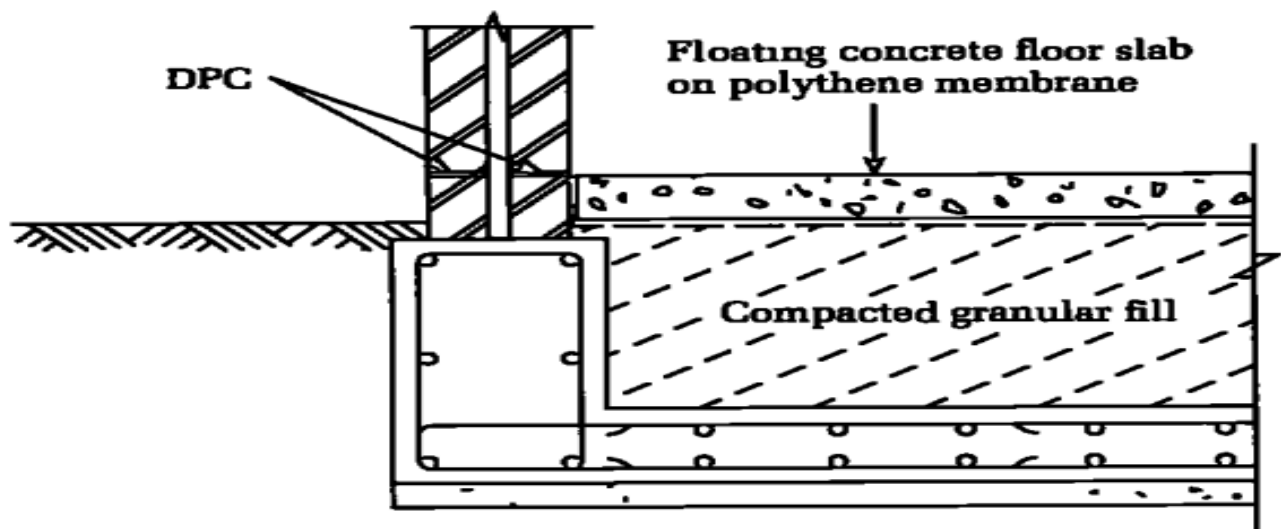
SLAB AND BEAM (UPSTAND BEAM) RAFT FOUNDATION [1]
